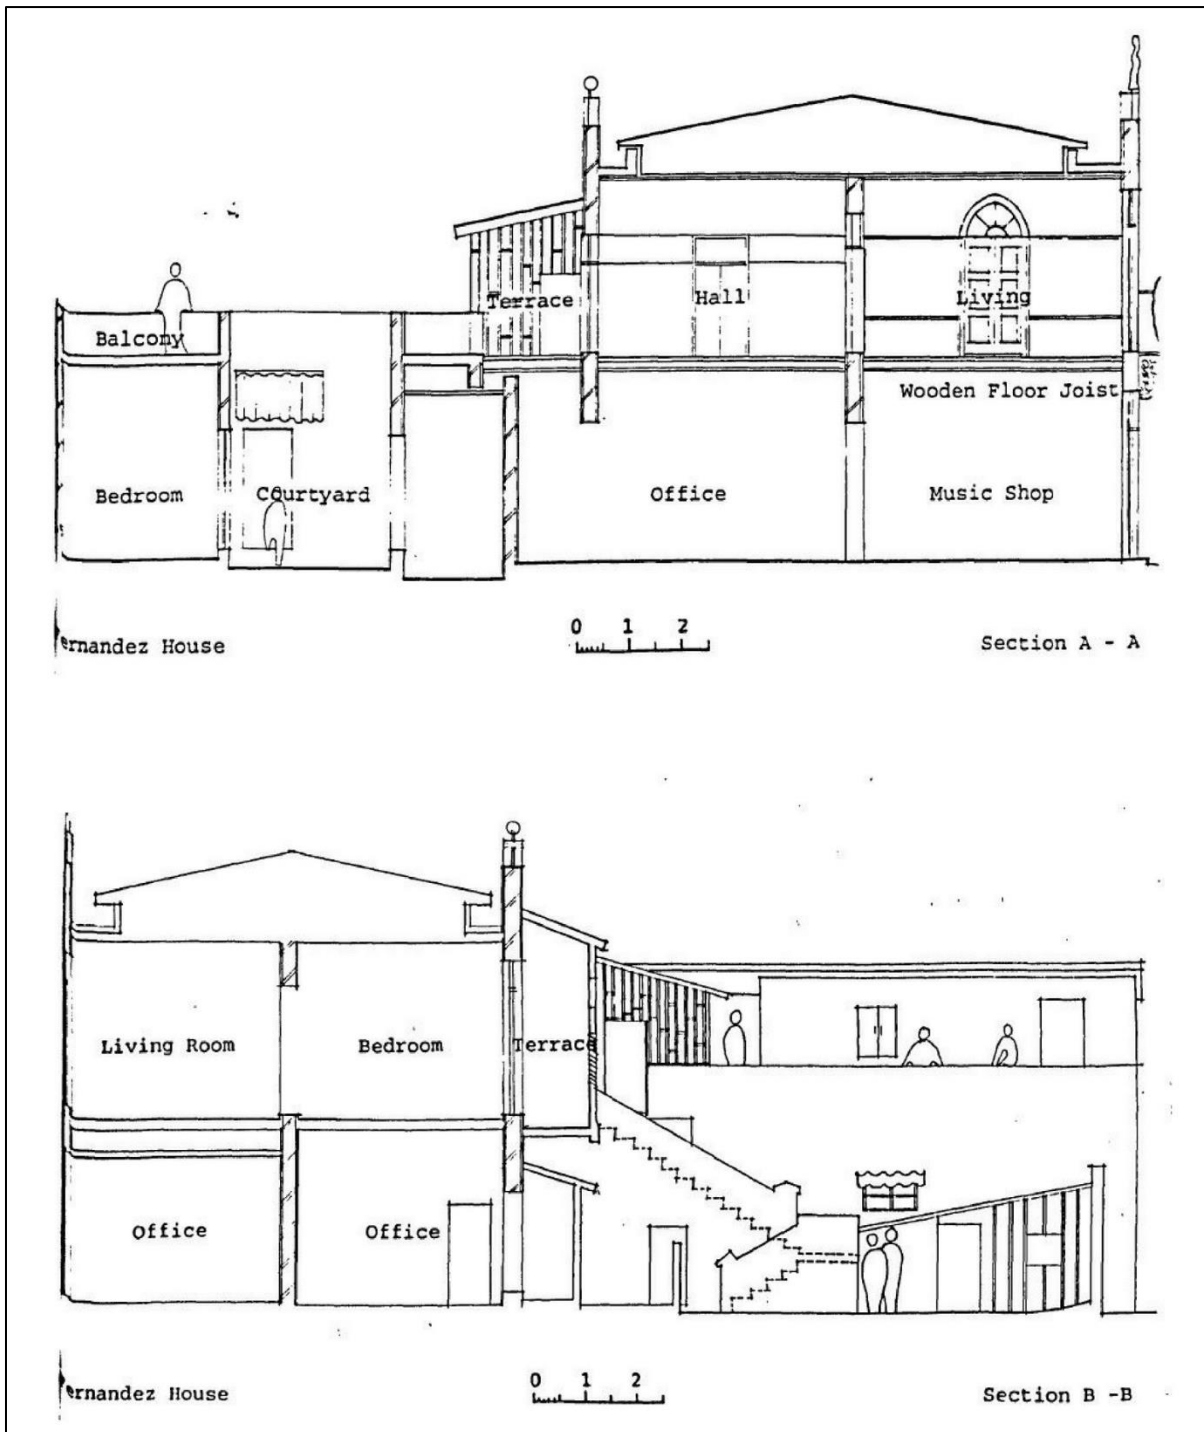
First generation Brazilian residential architecture – sections through the Fernandez House showing the block walls and timber flooring; source: Alonge (1994, pp.269-270).
